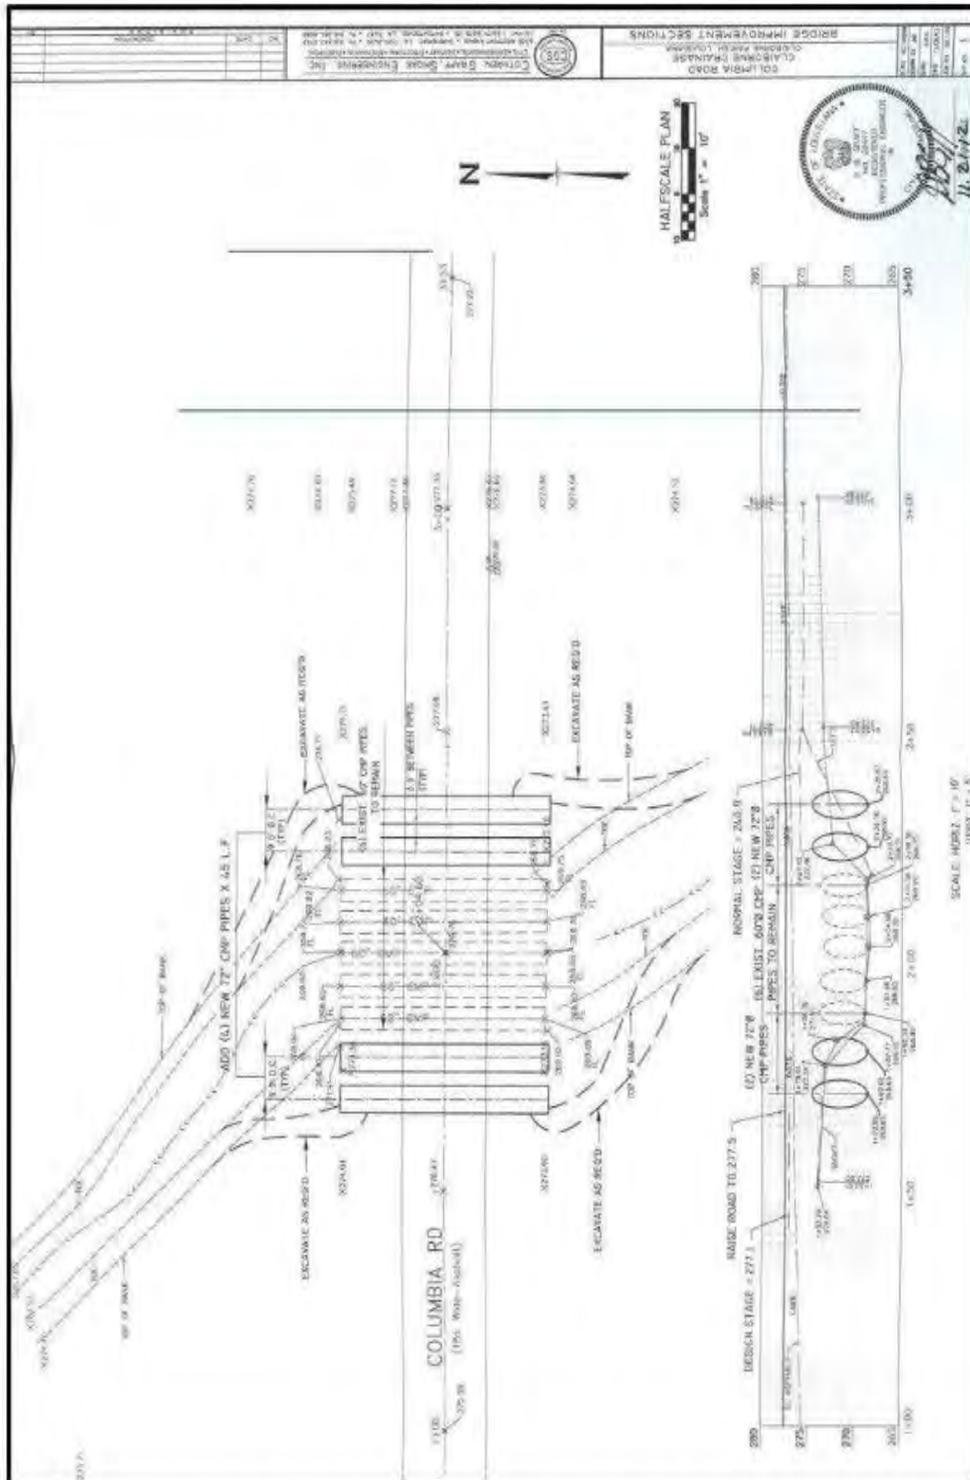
Construction plans for the proposed Columbia Road in PA 2 (Cothren, Graff, Smoak Engineering, Inc. 11/6/12).
